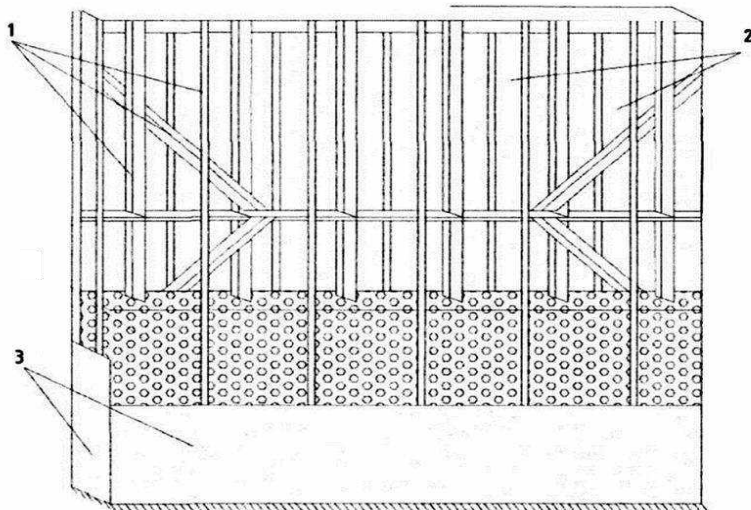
General view of the patented structural and technological solution UA 154847 «Frame Permanent Formwork System»: 1 - thermal profile; 2 - formwork made of thermal insulation boards; 3 - moisture-resistant gypsum board
